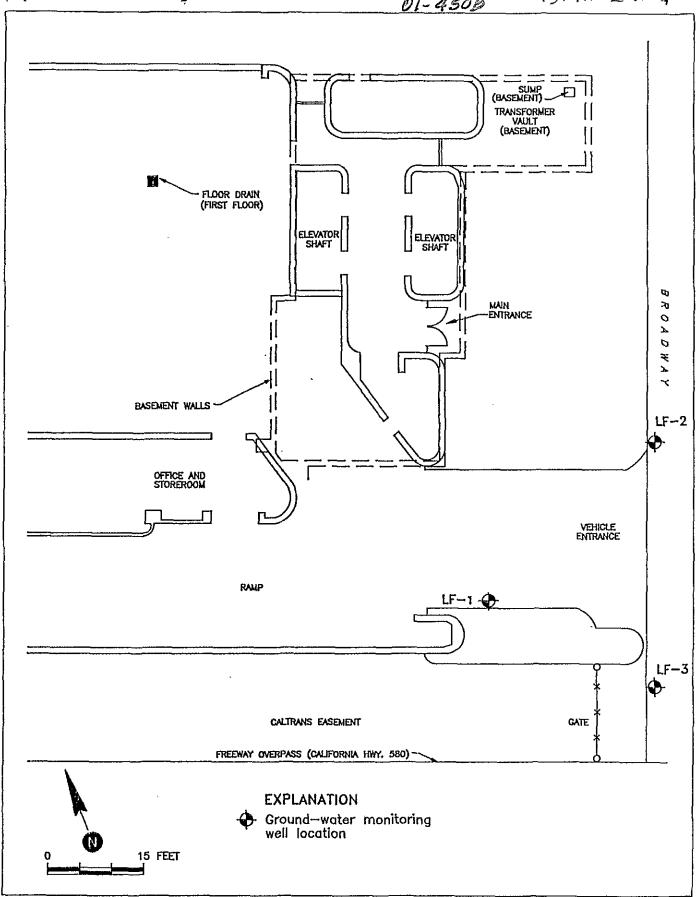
SITE PLAN AND MONITORING WELL LOCATIONS
